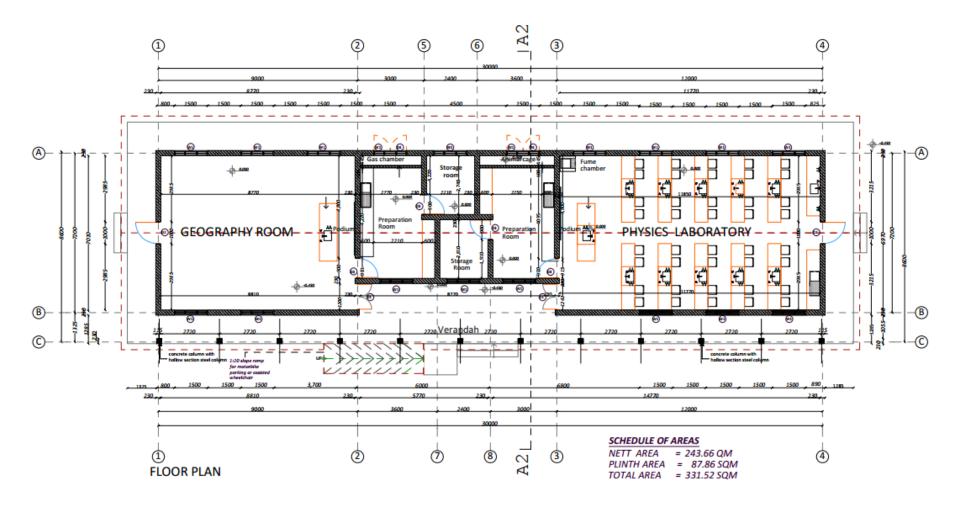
Proposed layout of the Laboratory room to be constructed
